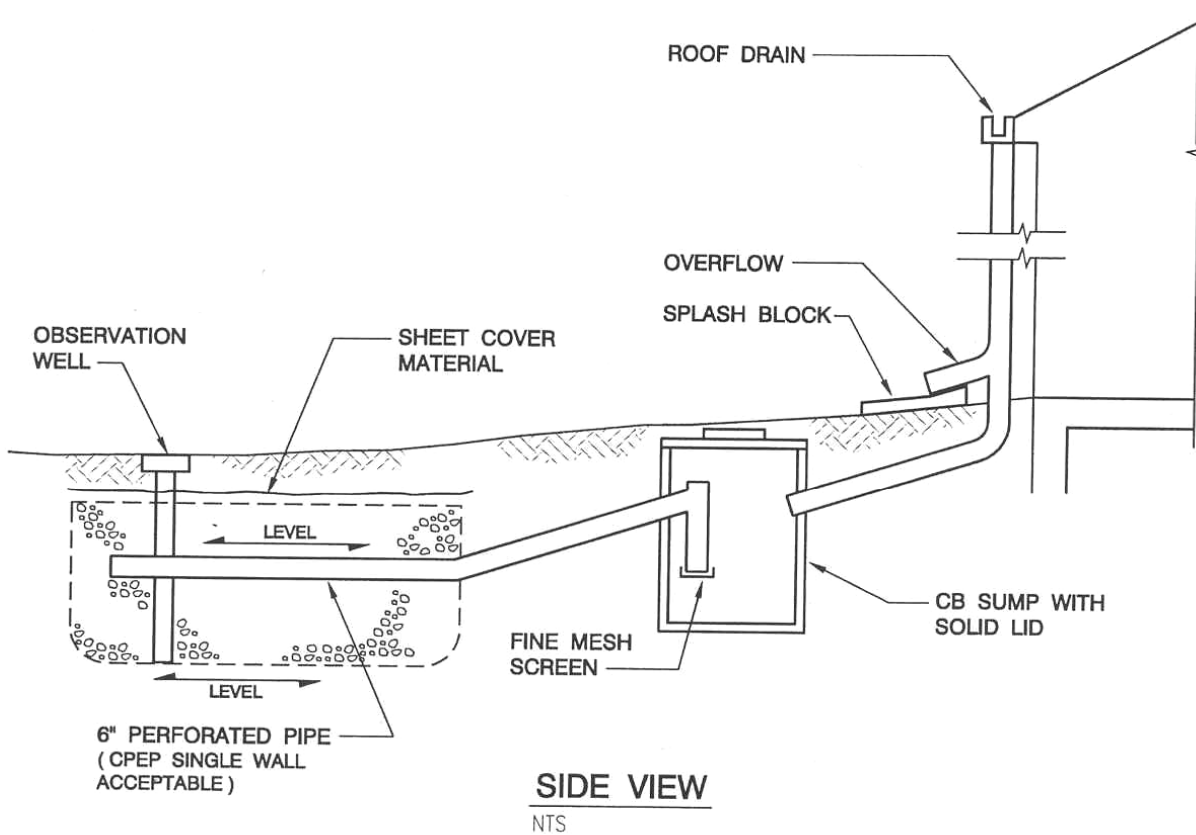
TYPICAL ROOF DOWNSPOUT SYSTEM (FROM GVRD, 1999)
